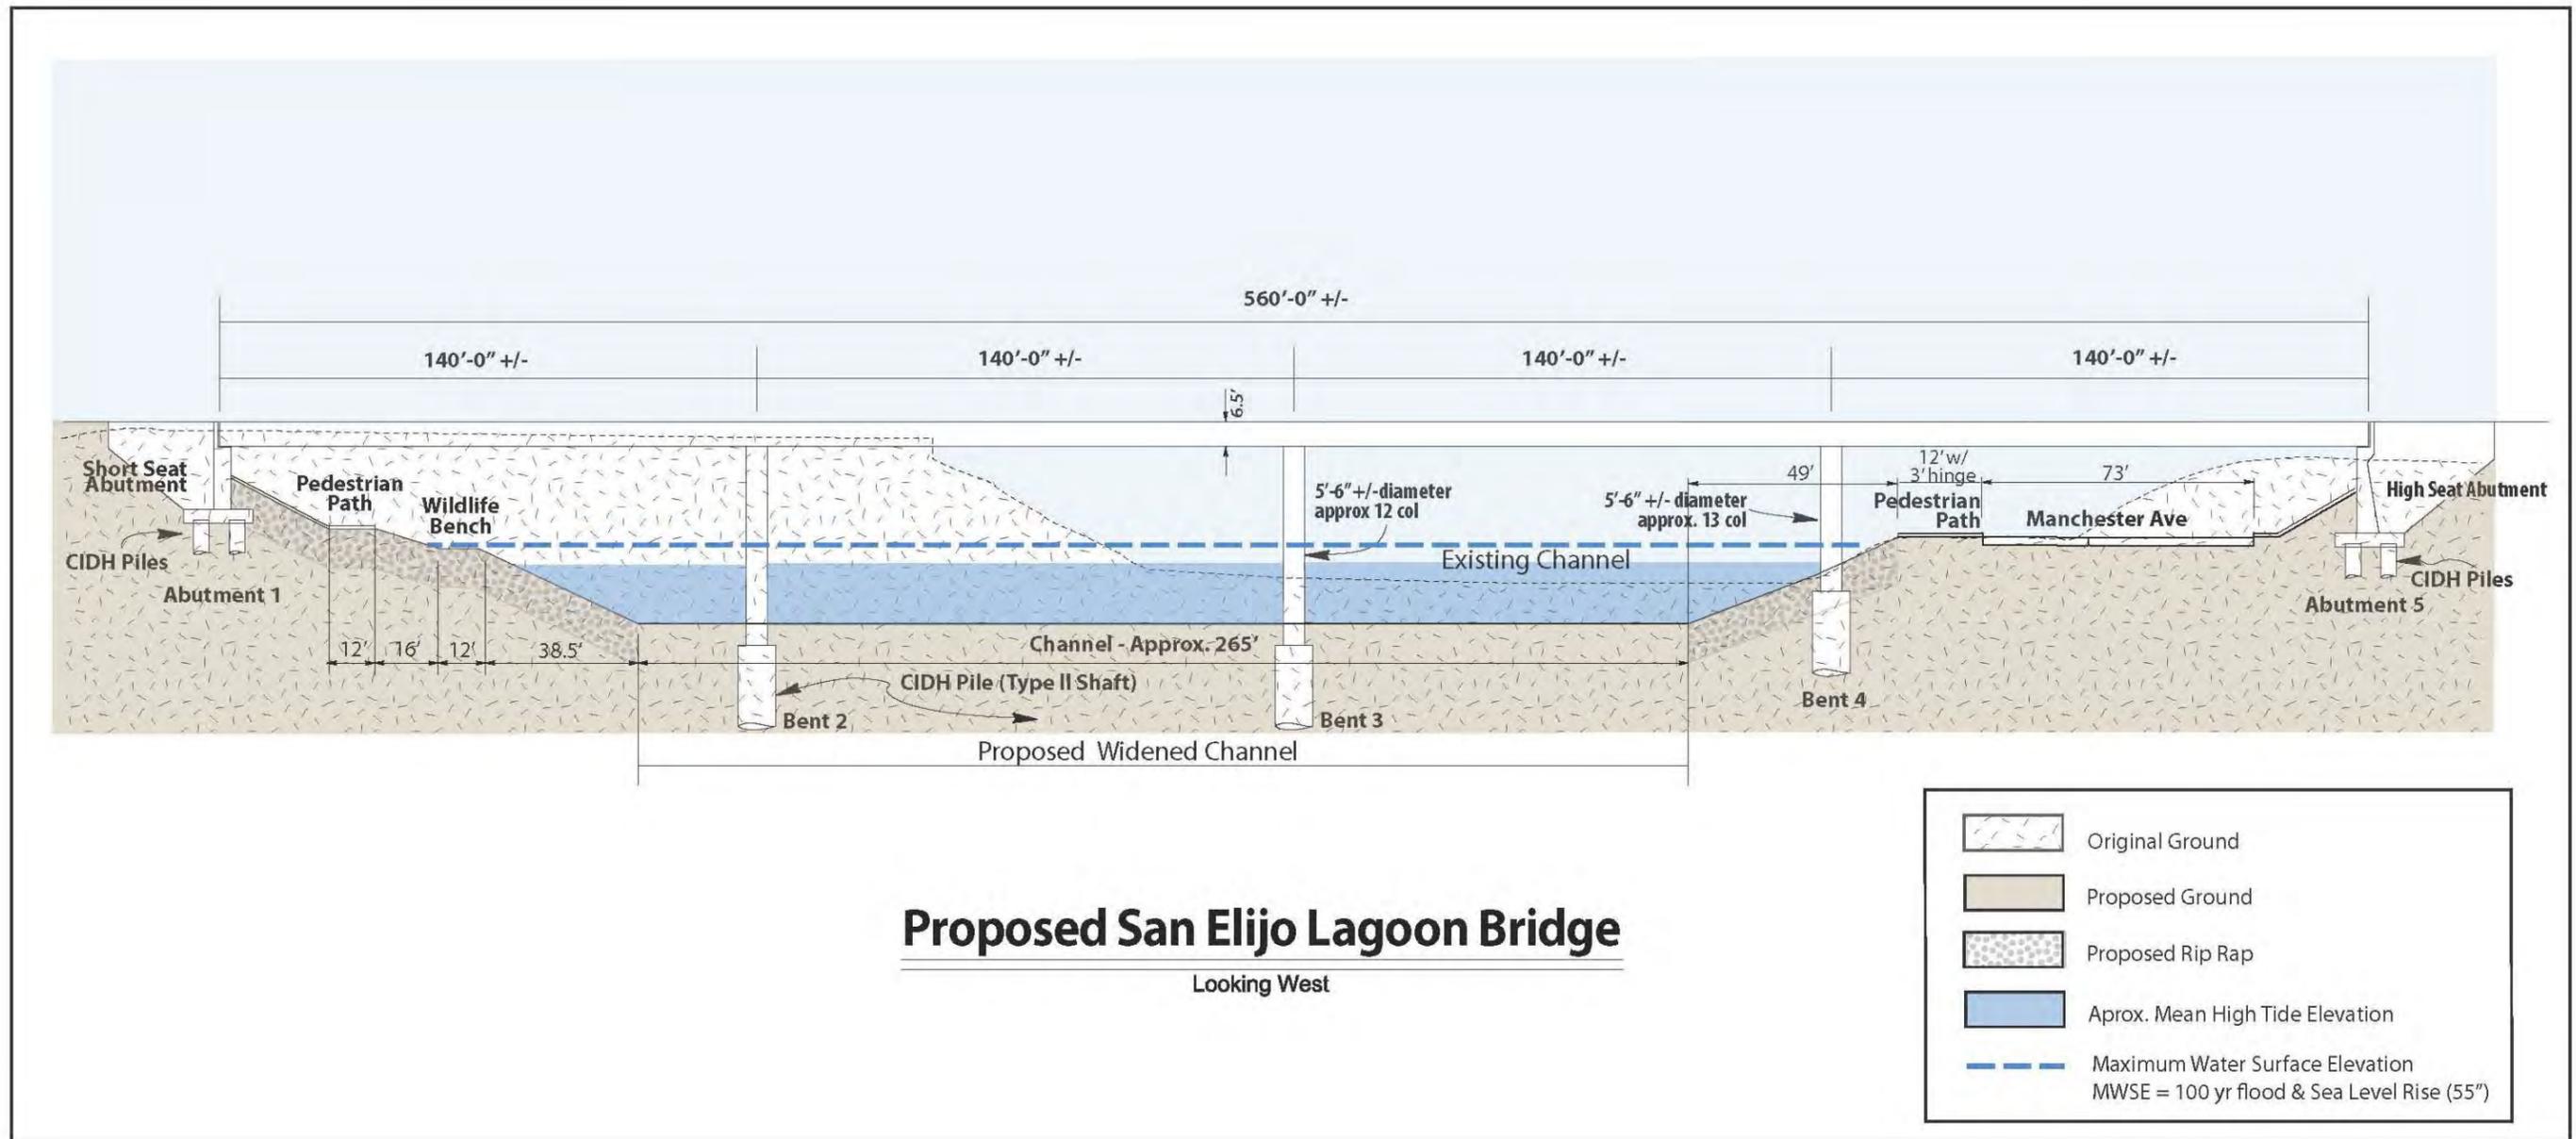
Proposed I-5 Bridge Channel Cross-Section
